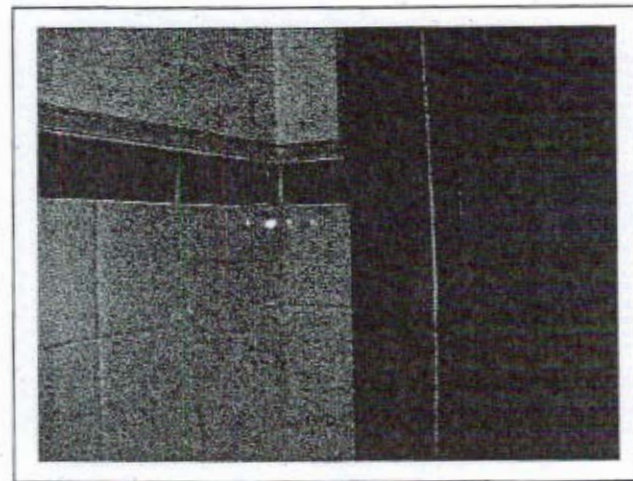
Viewing white 4" wall tile, Basement - SE room.
